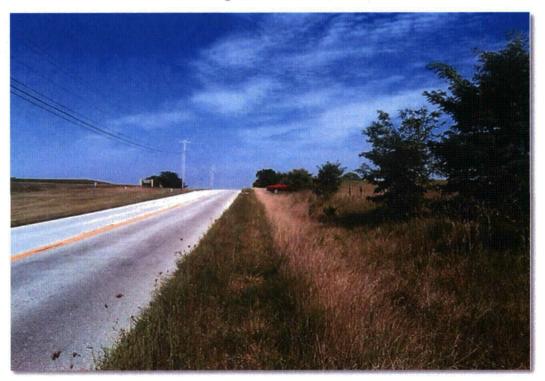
View of Proposed Radioisotope Production Facility Site from Gans Road, approximately 1.6 km (1 mi) North Photo Location #2
